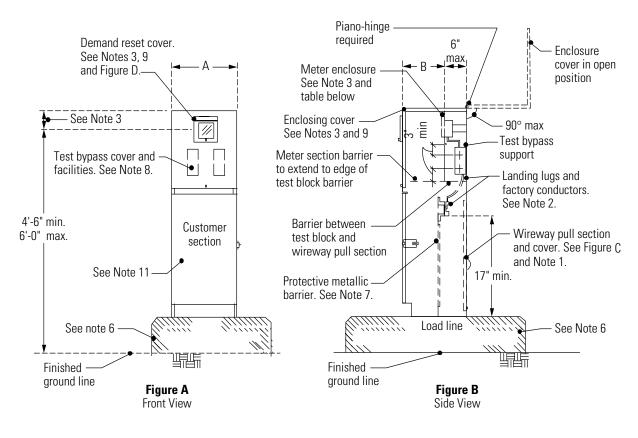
A free-standing meter enclosure must allow a 6-inch clearance at top and left side of meter socket to the enclosure rim, to allow the meter electrician to see and align the meter blades to the meter socket jaws.
